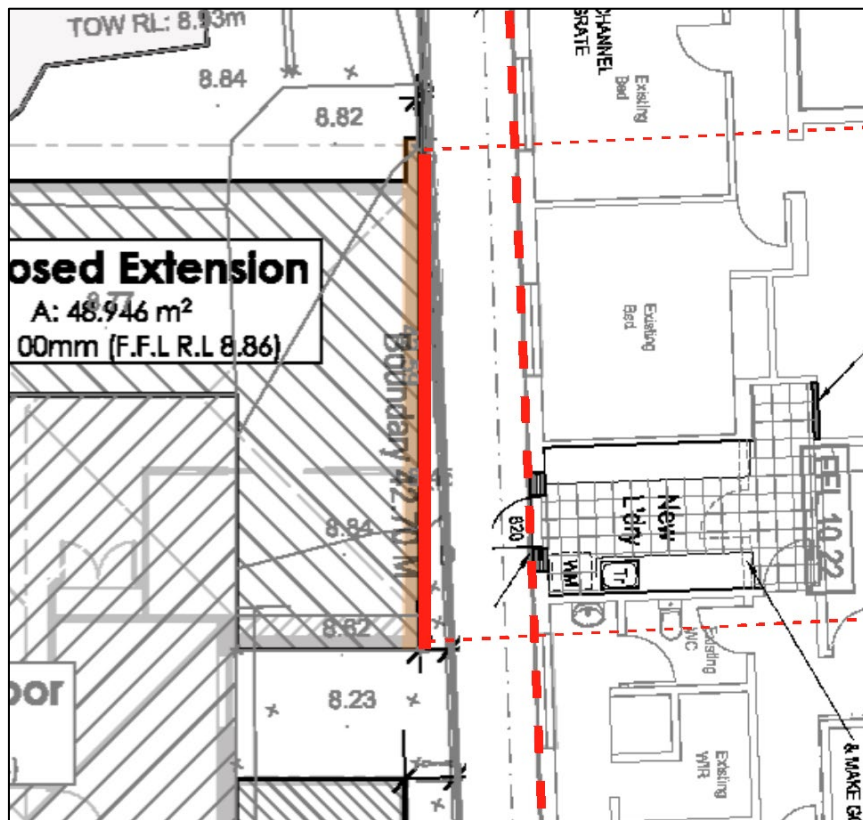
Overlay of subject site plan on right hand side (3 Arno Crescent) and ground floor from previous building approval for adjoining lot (5 Arno Crescent) with 1.6m setback from side boundary. Proposed boundary wall is highlighted red.
